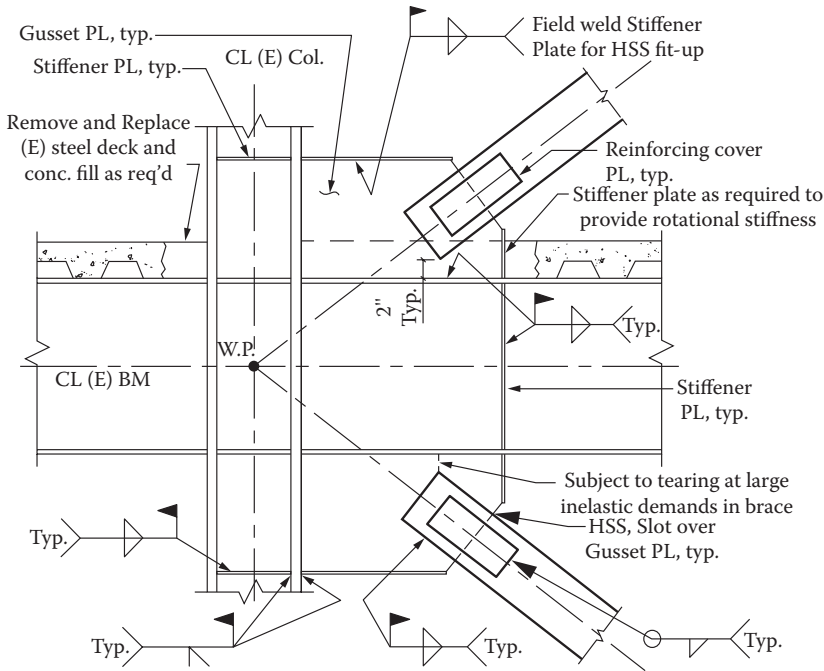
HSS brace at existing beam–column connection in ordinary CBF. *Note:* This detail, though compact, provides limited ductility and is only intended for use in low to moderate seismic applications.
